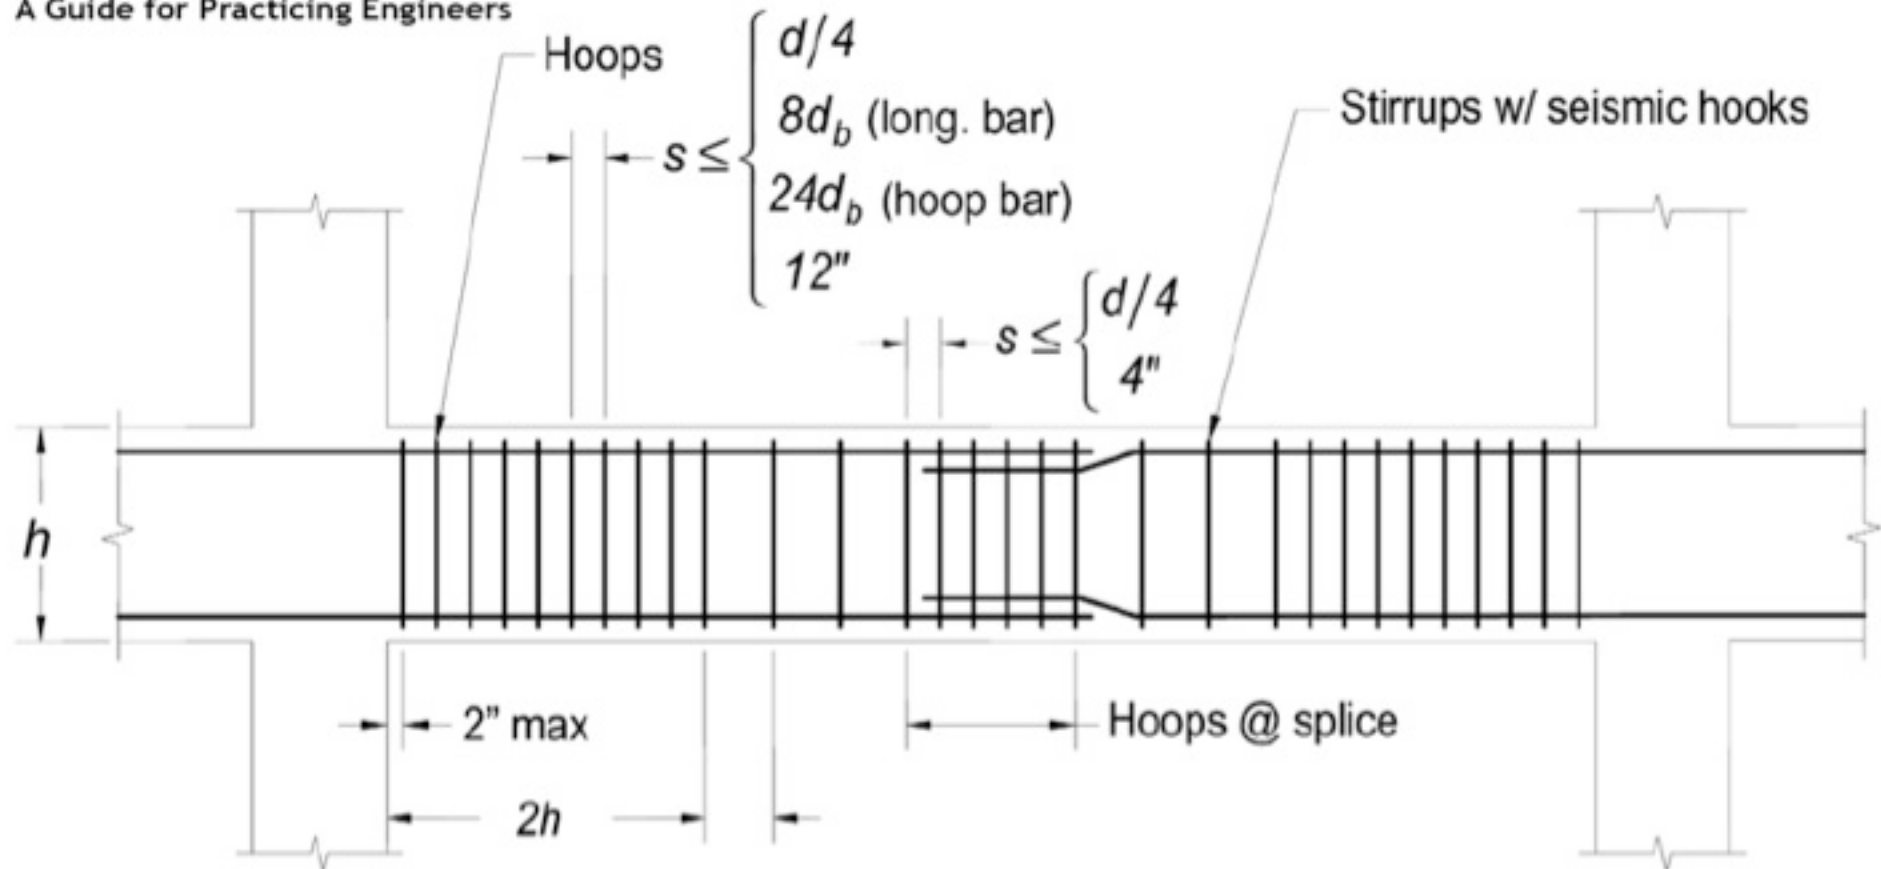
Hoop and stirrup location and spacing requirements.
